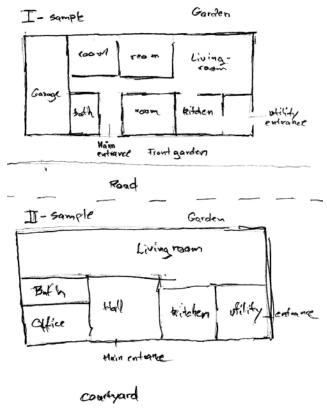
Ground plan of houses that I have lived in. Botin 2007.
